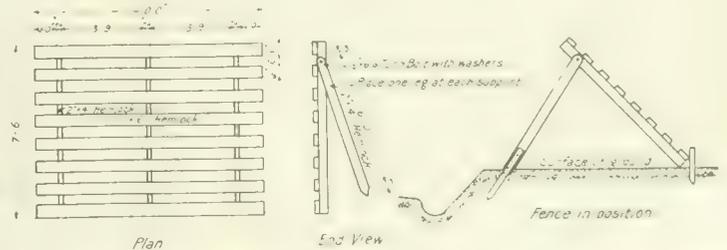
Snow Fence Used to Prevent Snow Drifting Across Roads.
